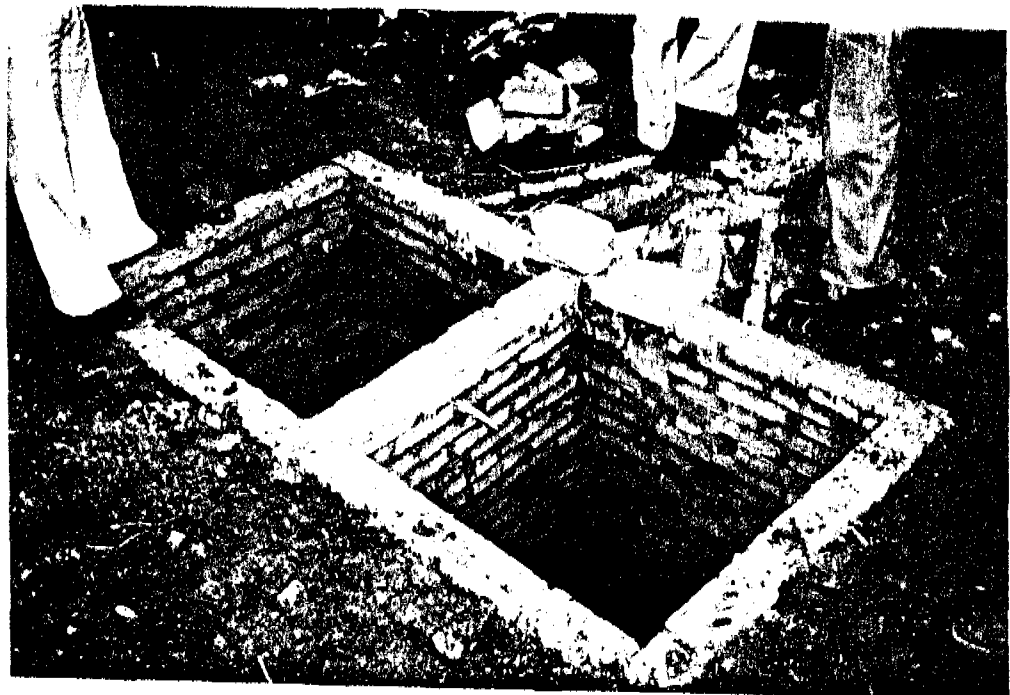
Standard Sulabh pits constructed outside the house. Kirtipur-Dec. 1981
